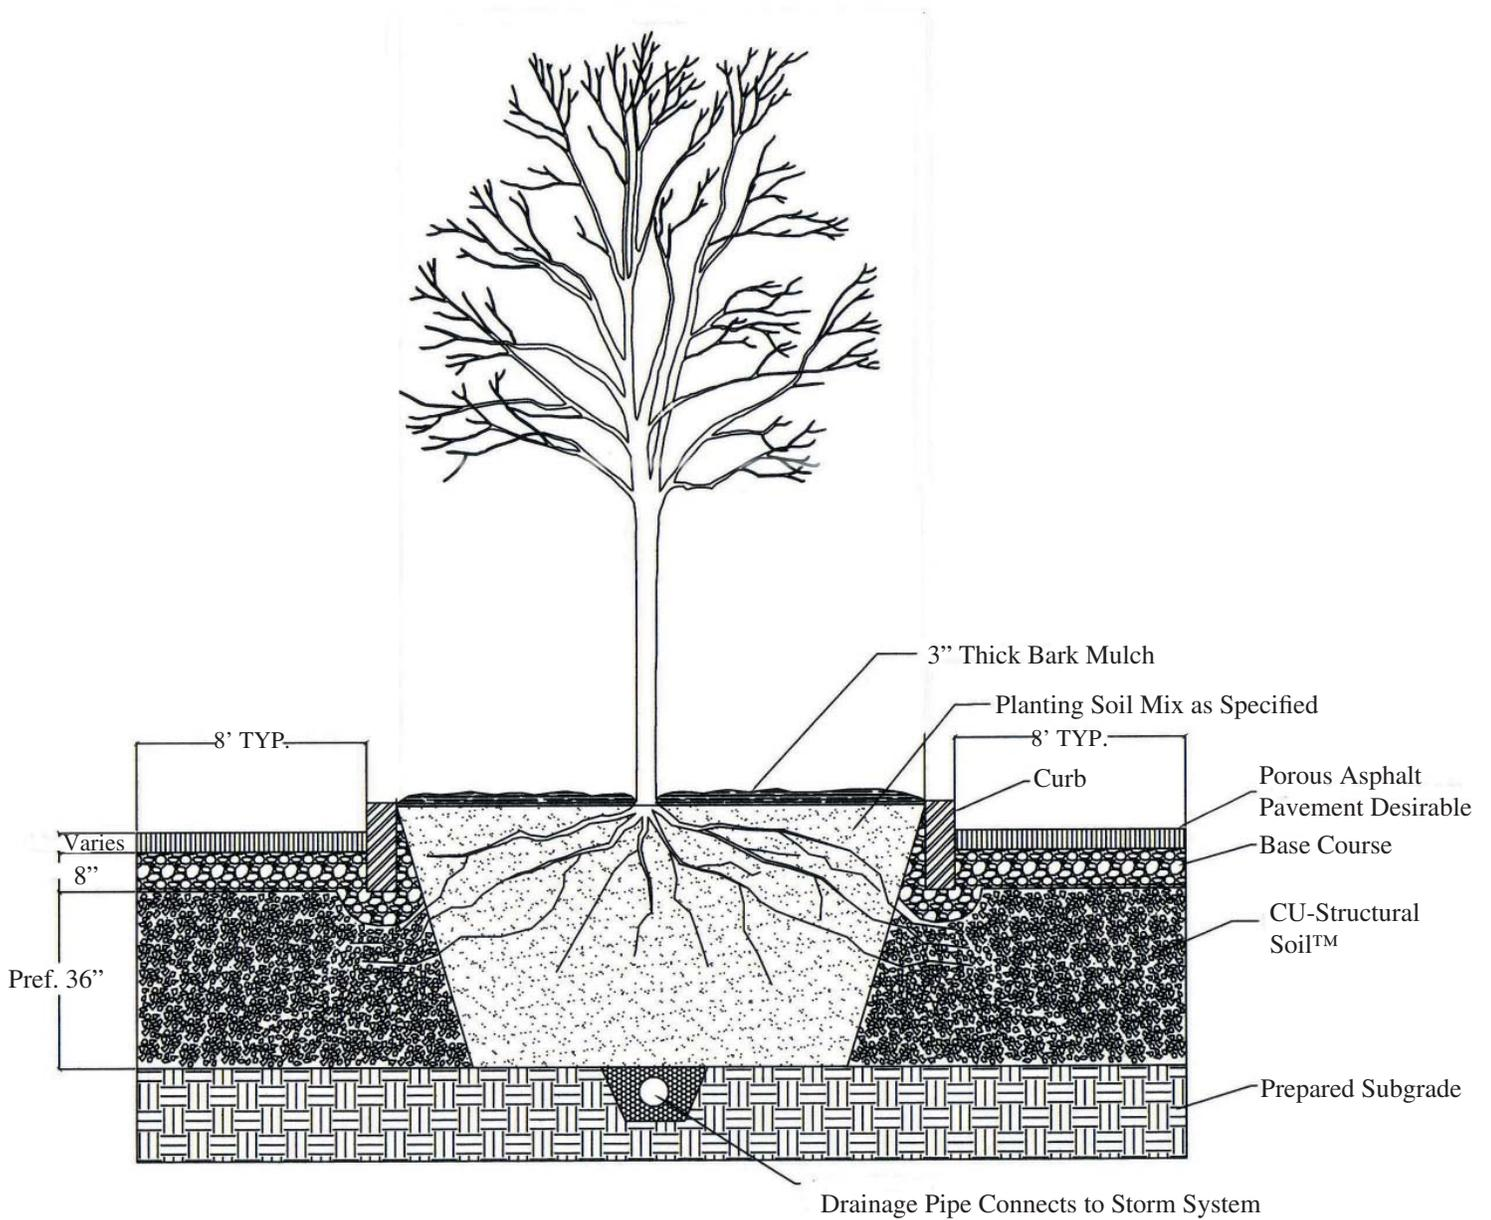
Bare root tree in typical parking lot island or plaza
